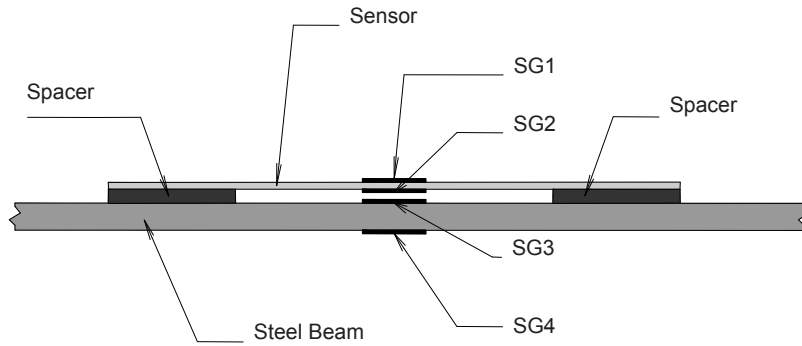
A typical specimen with the sensor and spacers glued to the steel beam
